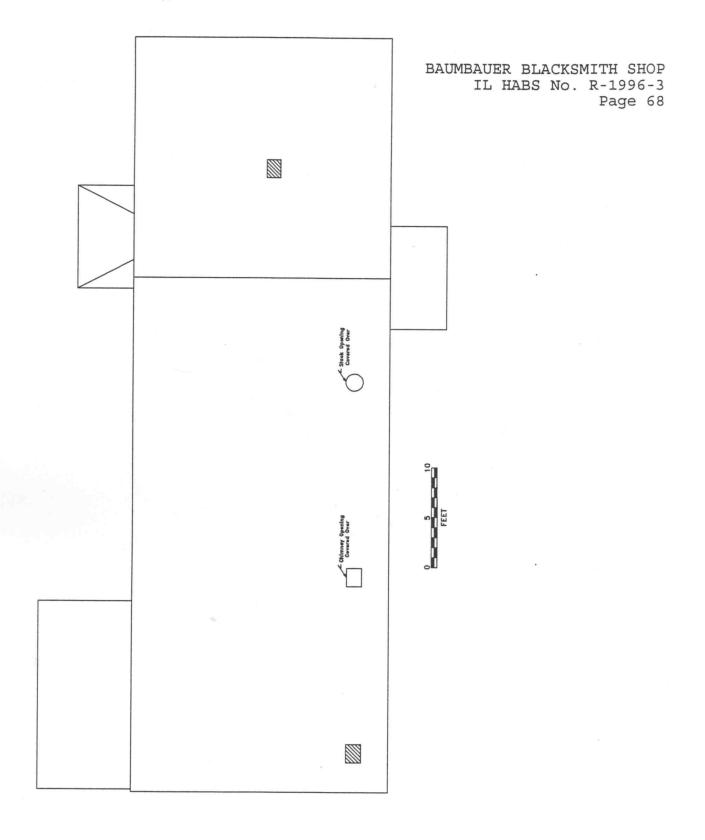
Roof plan of the Baumbauer Blacksmith Shop, 1995.
